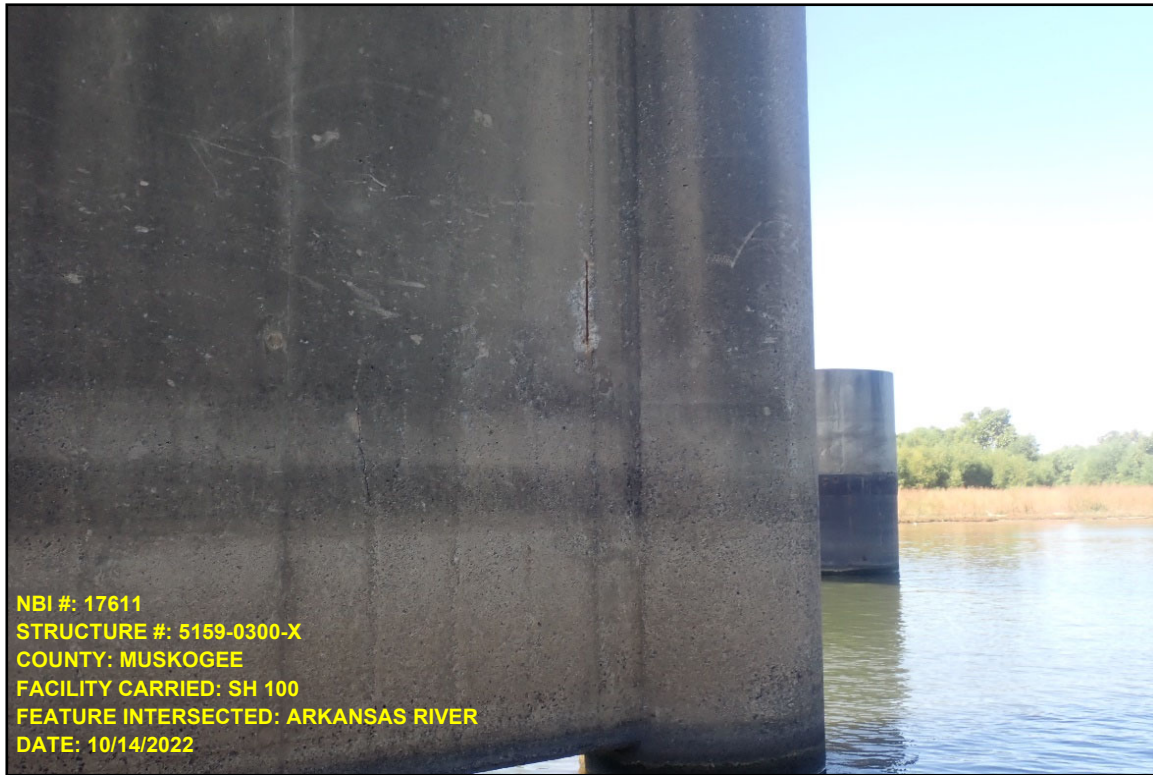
Pier 4, Webwall, Spall with Exposed Reinforcing
